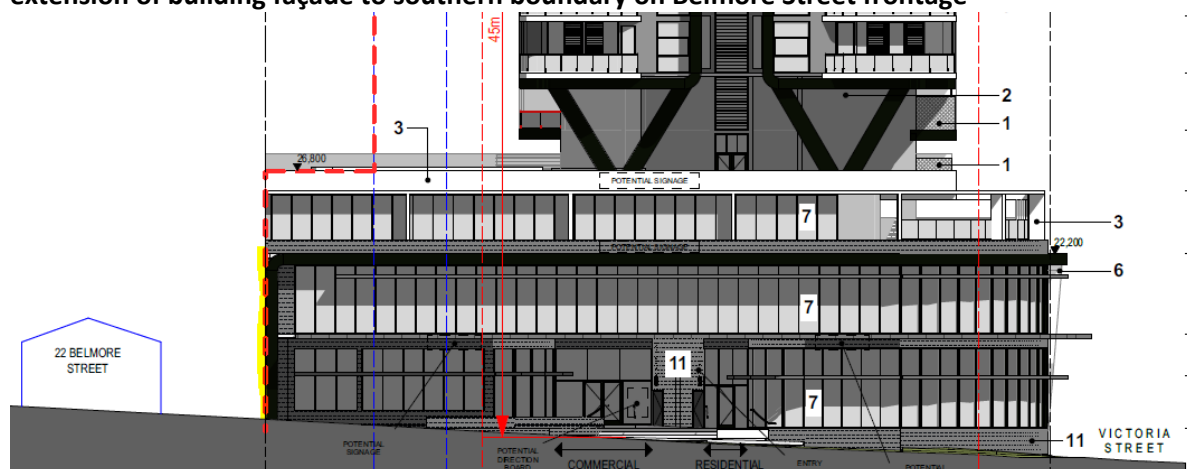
(part) Belmore Street elevation showing façade extends to southern boundary at ground and mezzanine levels (i.e. false wall with drainage swale behind).
